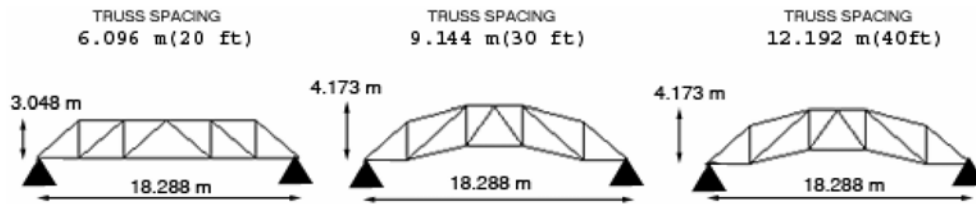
Most optimal truss layouts for different truss spacing (tributary width)
